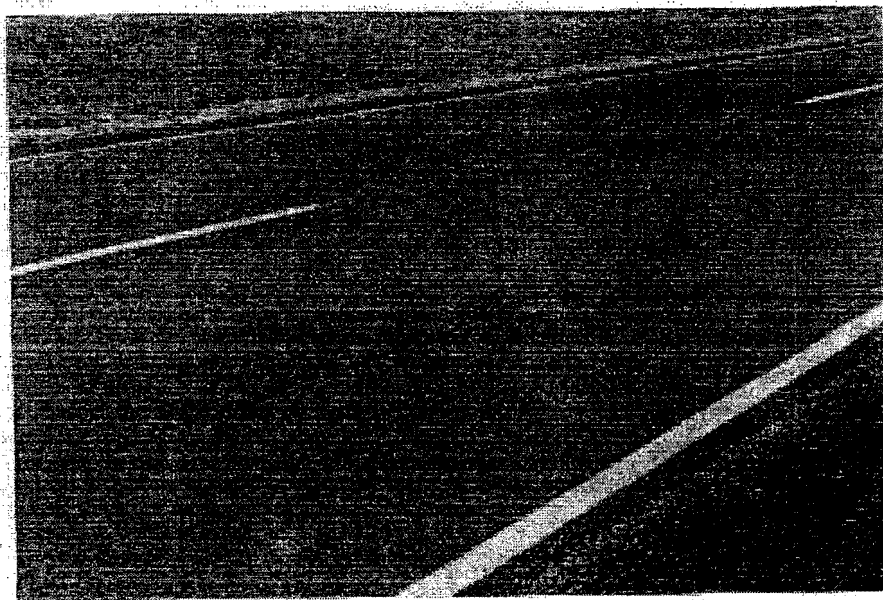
Compacted Final Pavement Surface with Roofing Shingles
